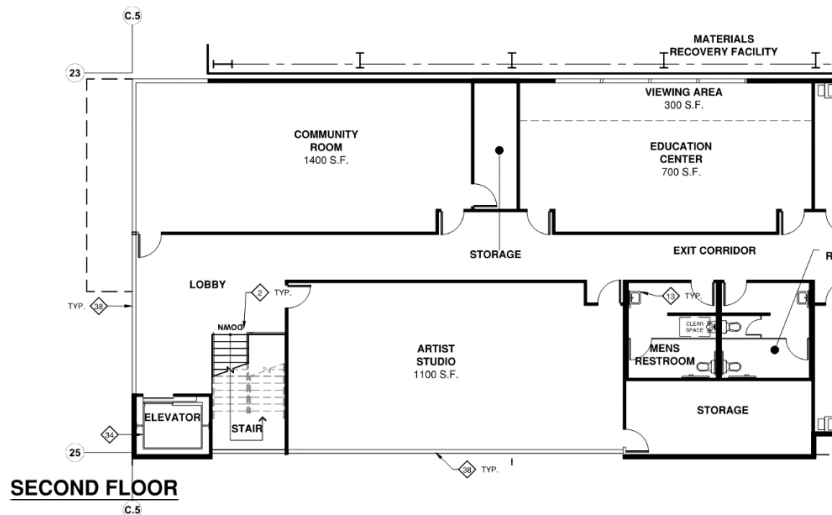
Concept A - Floor Plan for Education Center and Community Space
